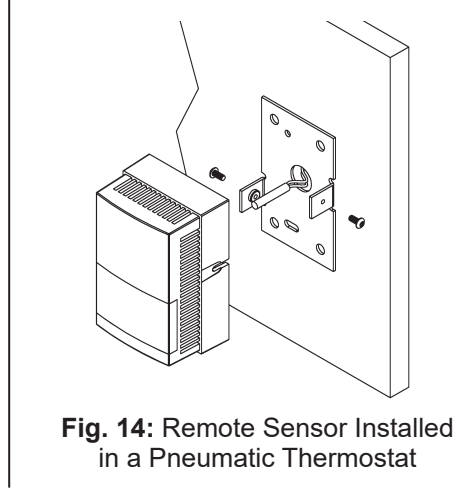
Remote Sensor Installed in a Pneumatic Thermostat
